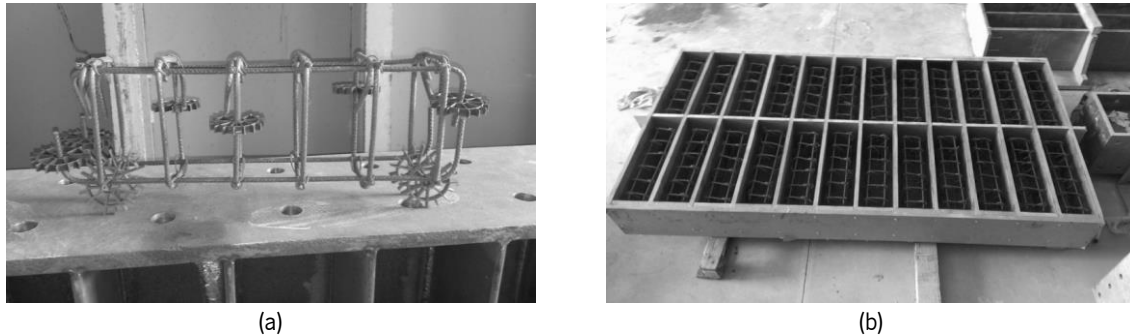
Casting preparation of the beam bending tests specimens: (a) finished aspect of the steel reinforcement and (b) mould preparation.
